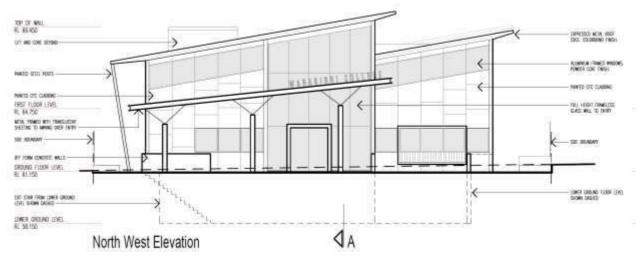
North west elevation (streetscape view) of proposed building (source: accompanying architectural plans prepared by Koturic+Co)
